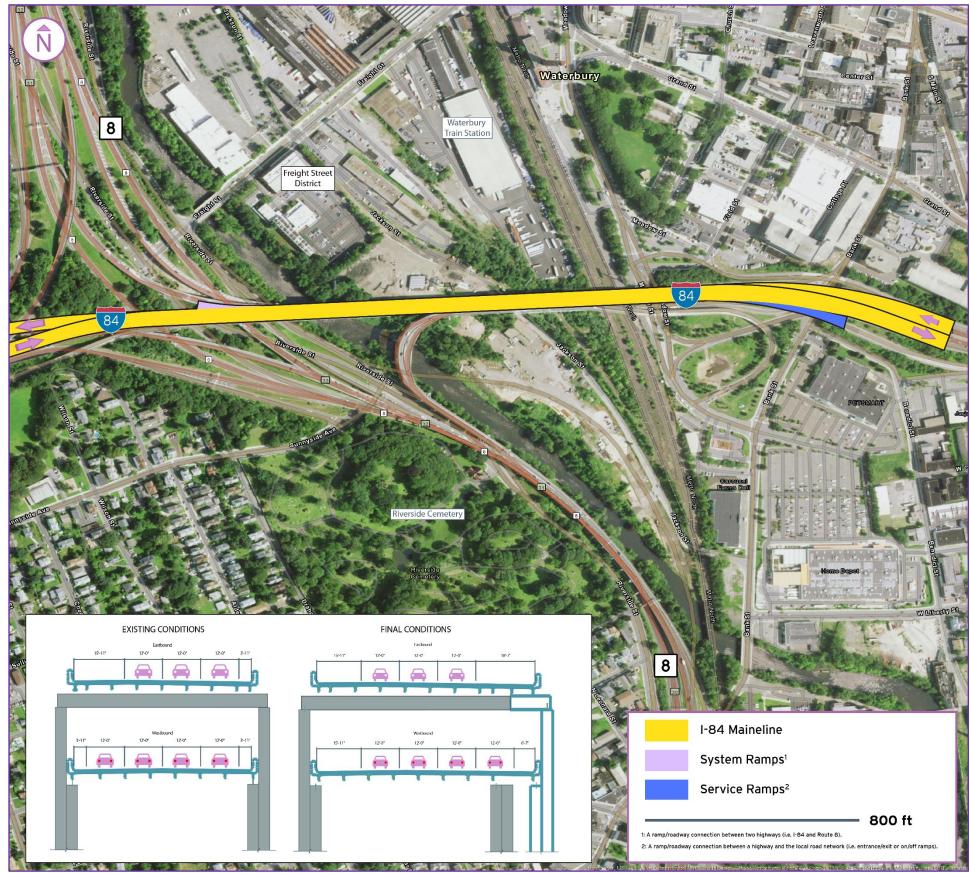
I-84 Bridge Rehabilitation with Widening to Facilitate Staging
